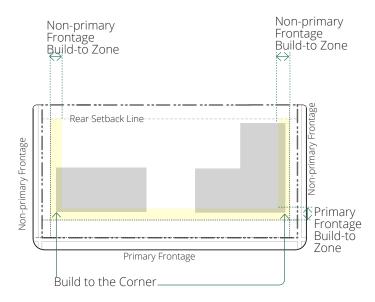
B-1. Build-to Corner and Build-to Zones
